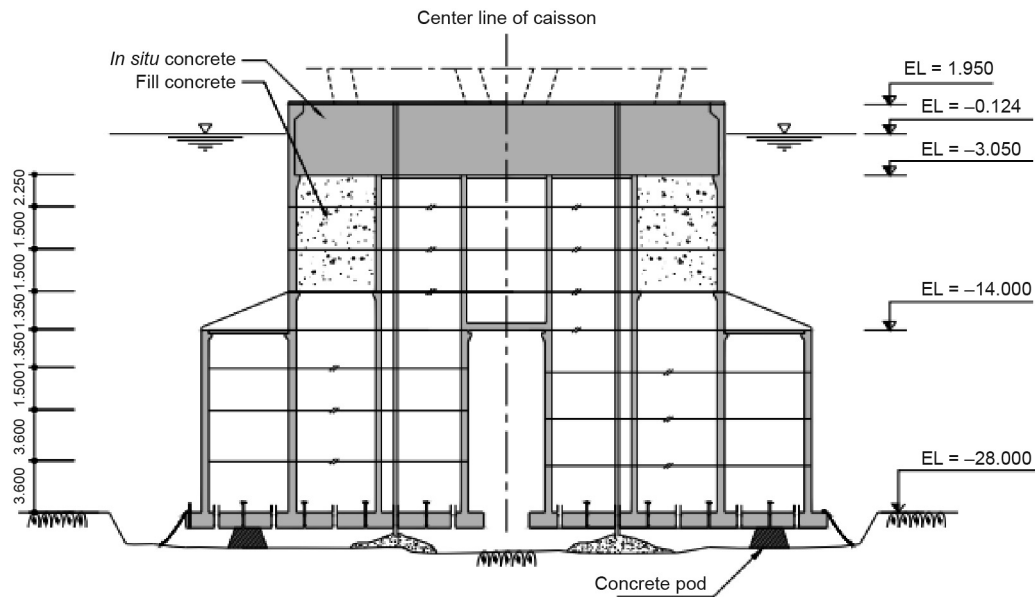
A pylon steel caisson in the Busan–Geoje Fixed Link. EL: elevation. Unit: m.
